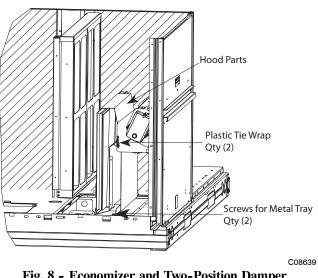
Economizer and Two-Position Damper Hood Parts Location
